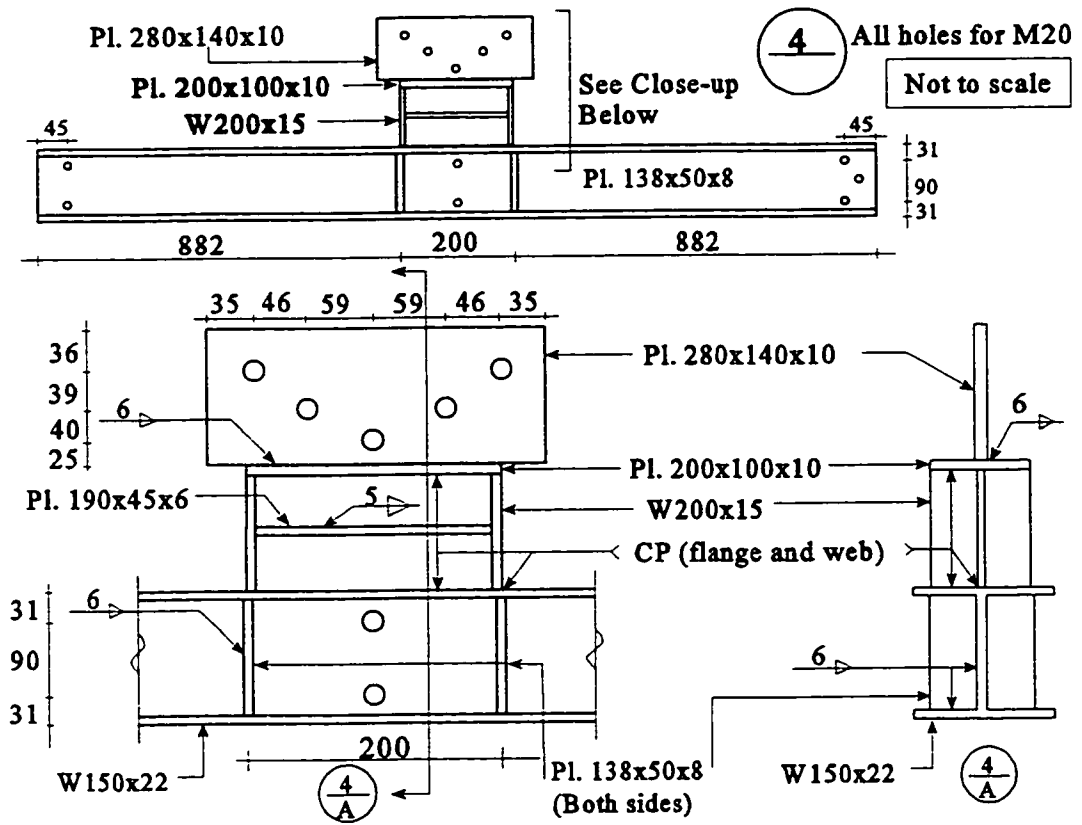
Details of the first alternative SPS and its bottom beam.
